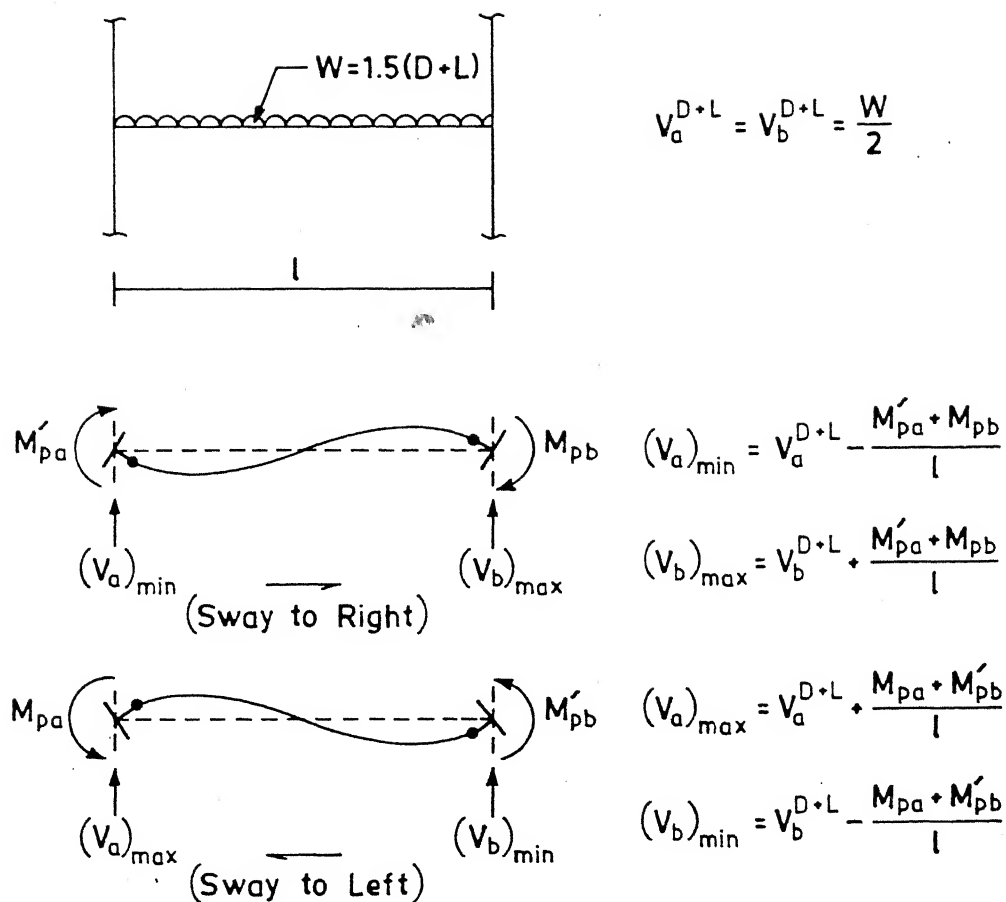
LOADING CONDITION FOR DESIGN OF SHEAR REINFORCEMENT IN FLEXURAL MEMBERS. (UNIFORMLY DISTRIBUTED LOADING)
